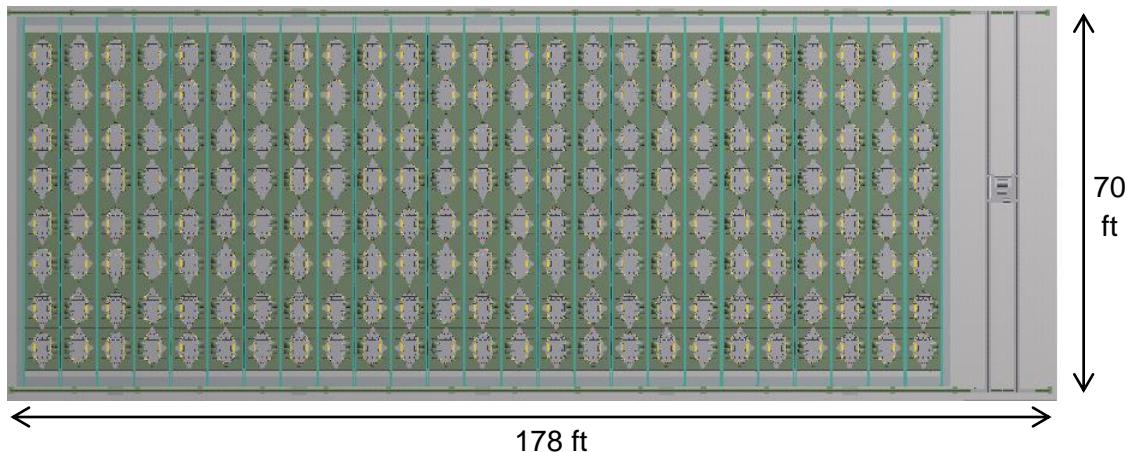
Plan View of a 224-Stack ECM Enclosure
